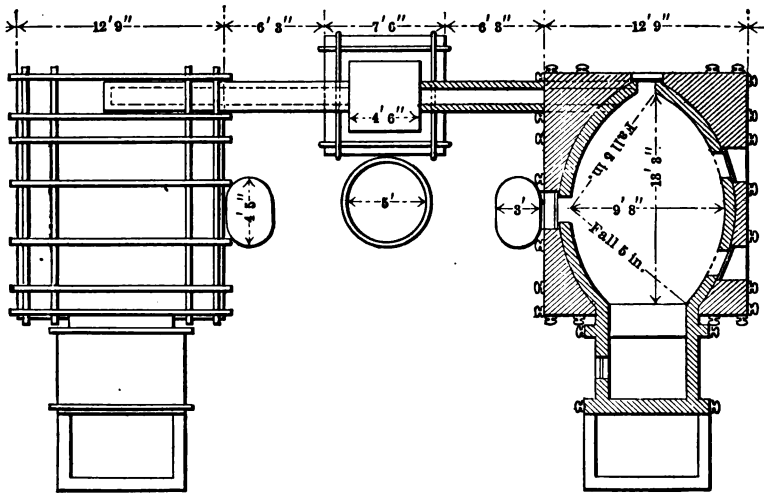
Plan of Tasmanian Tin-smelting Furnace
